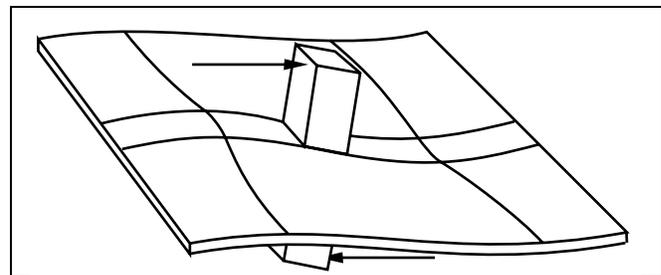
Slab Distortion in Flat-Plate Connection under Lateral Load
